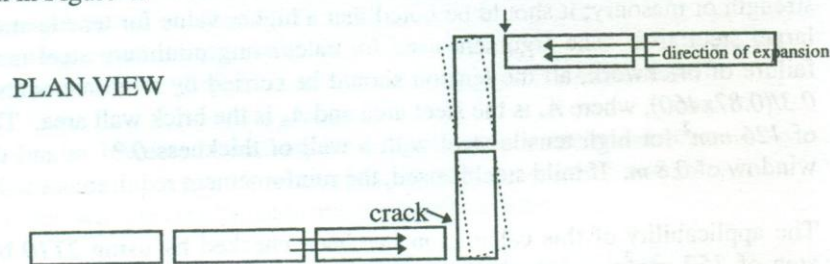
Cracking due to moisture or thermal expansion when two long walls are connected by a short wall.
